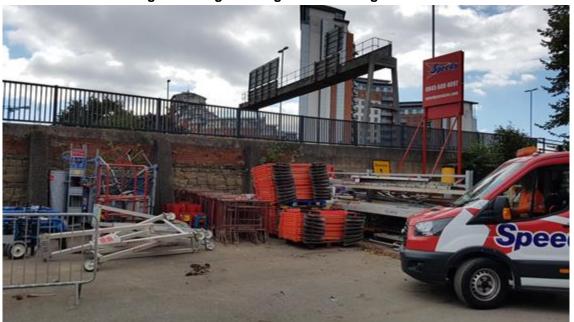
Current setting of Wellington Bridge. Taken facing South-west.
